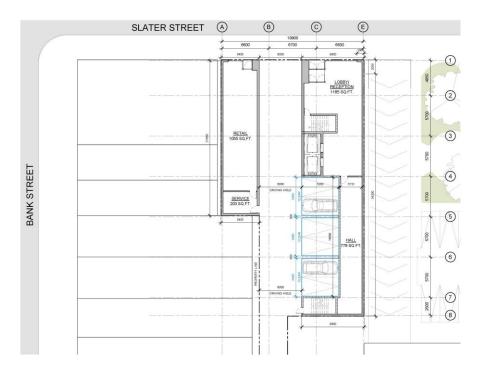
Ground floor plan of the proposed development. Note the access driveway to the rear that references the existing carriageway and the buildings relationship with Slater Street and the rear access for buildings along Bank. Source: RLA May 24 2019.
